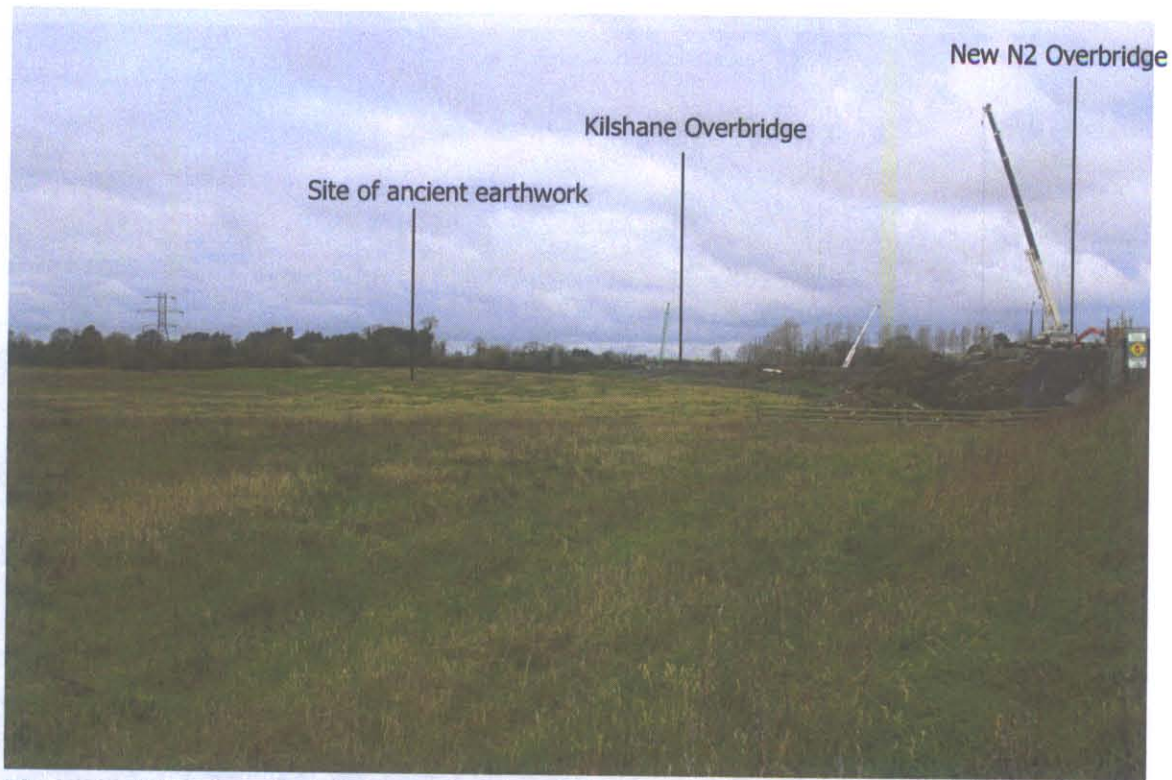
View from N2 at proposed site entrance, looking to the west area of the site. The Biological Facility will be located to the front of the pylon on the left. The C&D Waste Facility will be located to the front of the pylon on the right.
